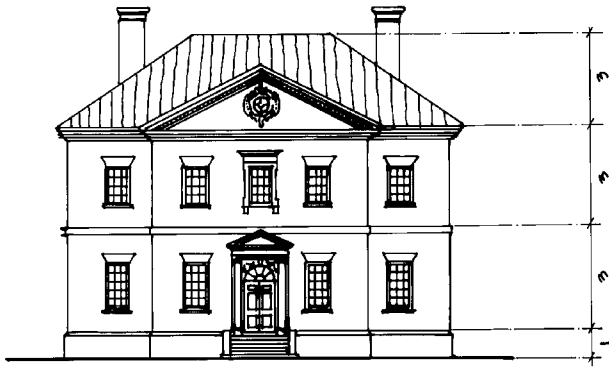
Front facade of the central block of the Hammond-Harwood House. The water table, belt course, and cornice (entablature) divide the facade of the building into nearly equal parts.
